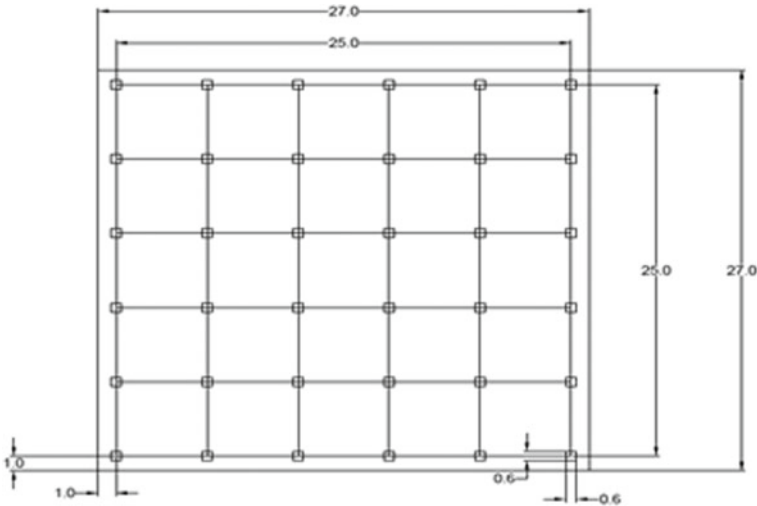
Plan view of the building and foundation (All dimensions are in metres)
